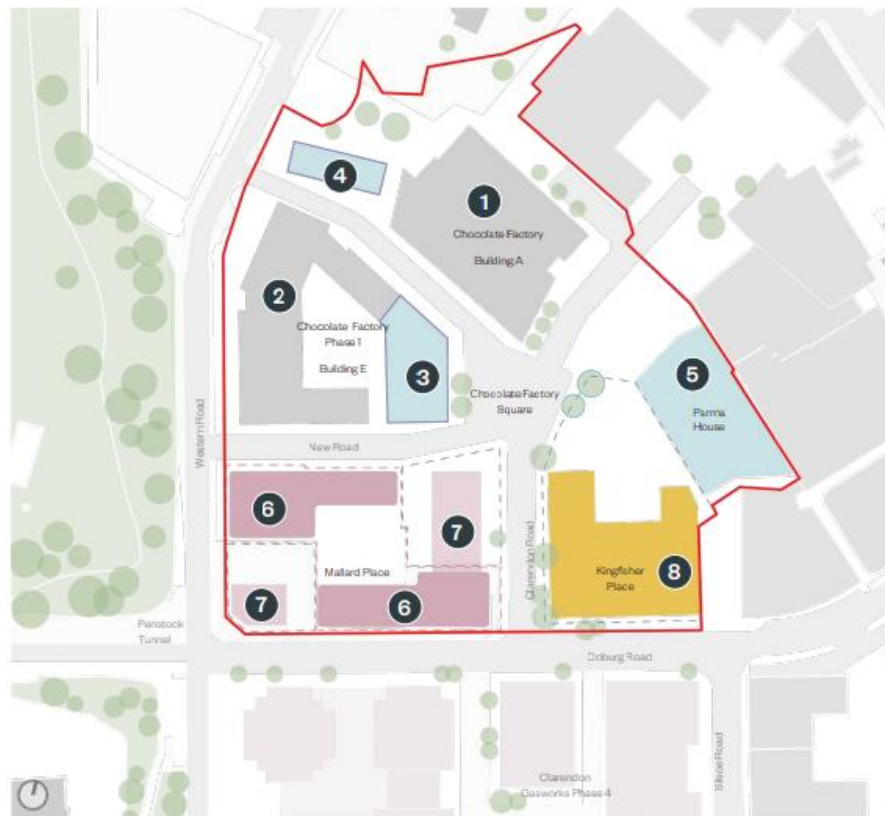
Indicative Masterplan – Existing and proposed workspace/residential
